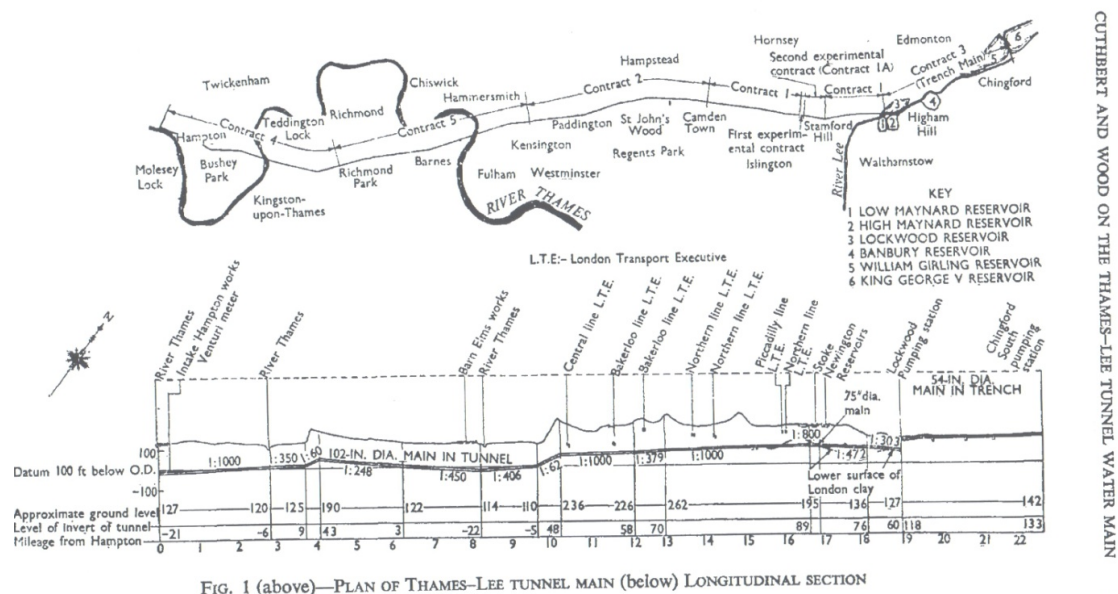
(above)—PLAN OF THAMES-LEE TUNNEL MAIN (below) LONGITUDINAL SECTION
